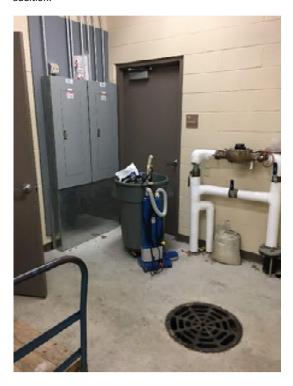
Painted CMU walls in maintenance area of 2012 addition.
